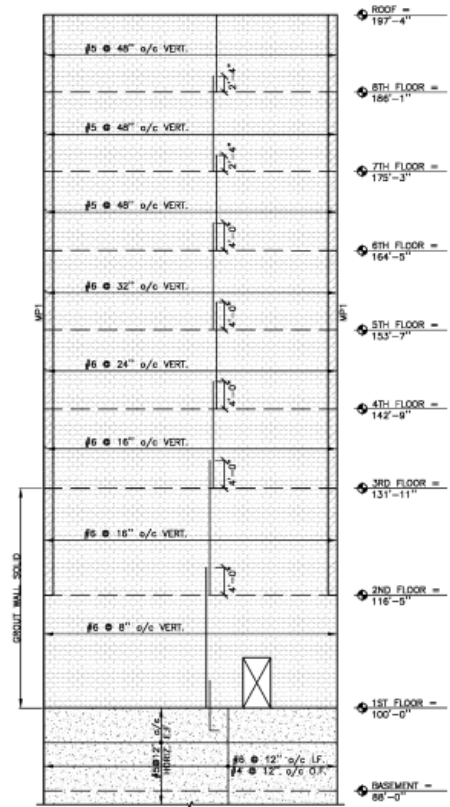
Masonry Shear Wall (S10.3 Drawing 2)
